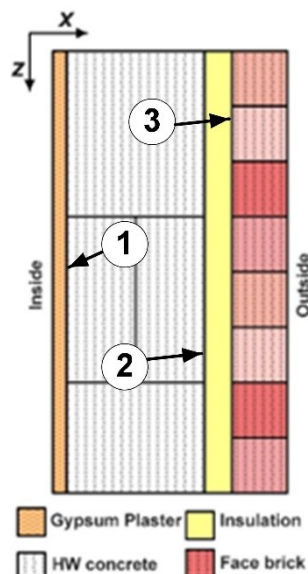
Cross section of a four-layer wall and the numbers mean border layer 1,2, and 3.
